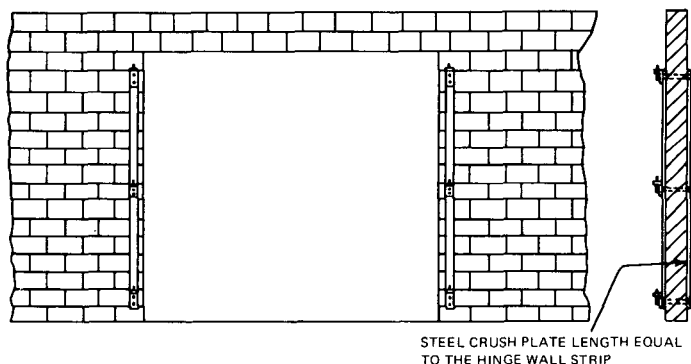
Hollow concrete masonry wall prepared for doors swinging in pairs — lap mounted.
